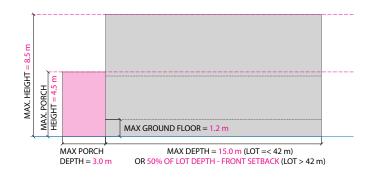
SIDE ELEVATION WITH FRONT PORCH
